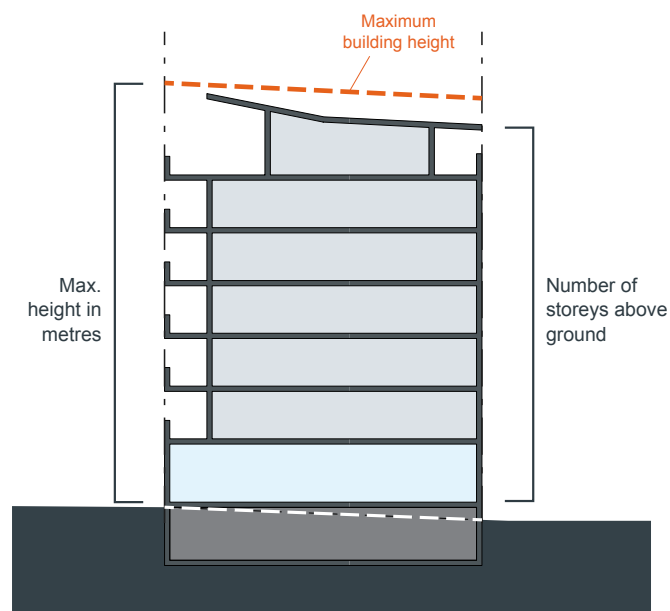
C.1 The total height of a building informs the number of storeys possible in a development. Floor to ceiling heights vary depending on the use, i.e. shops and offices are typically higher than residential apartments
